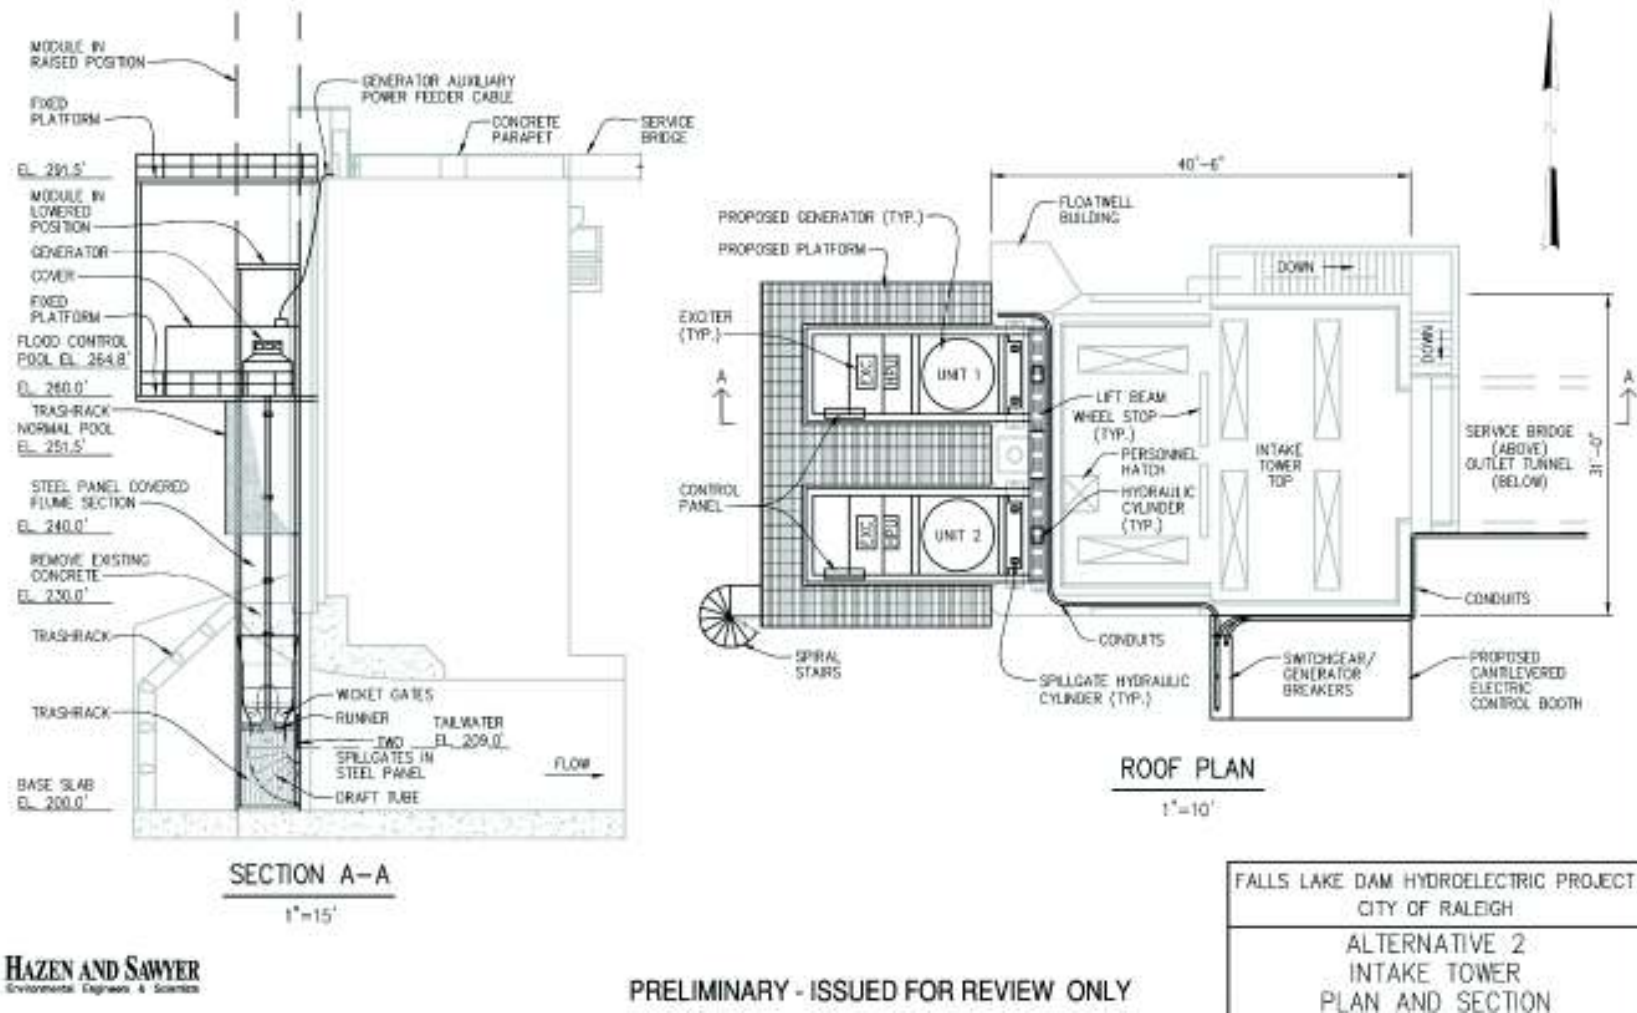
Alternative 2: Intake Tower – Plan and Section
